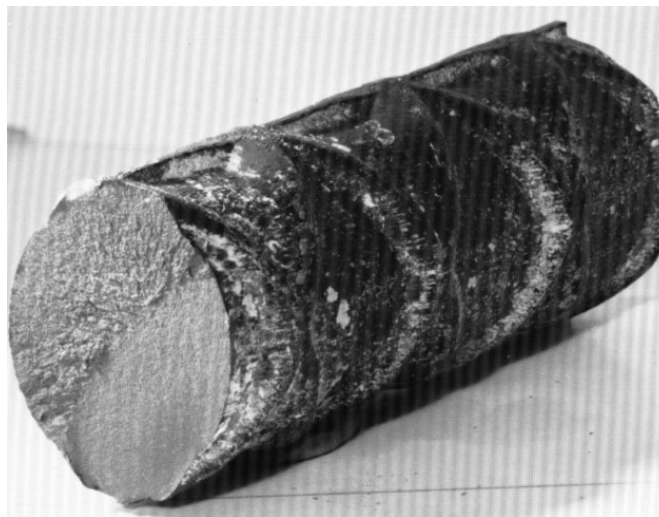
Steel reinforcement fatigue fracture (ACI 215R, 1974)
